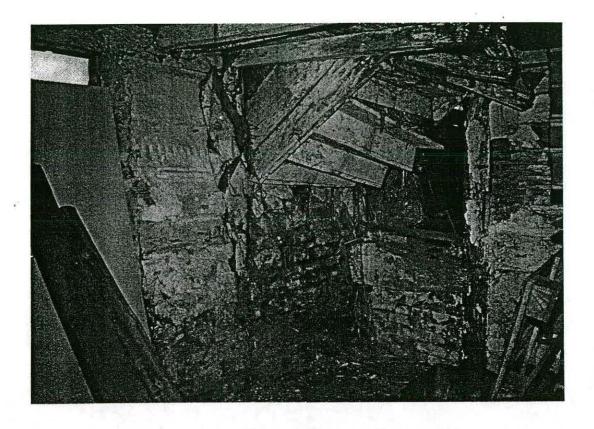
Timber doorhead to former exterior door opening in W wall of medieval hall
